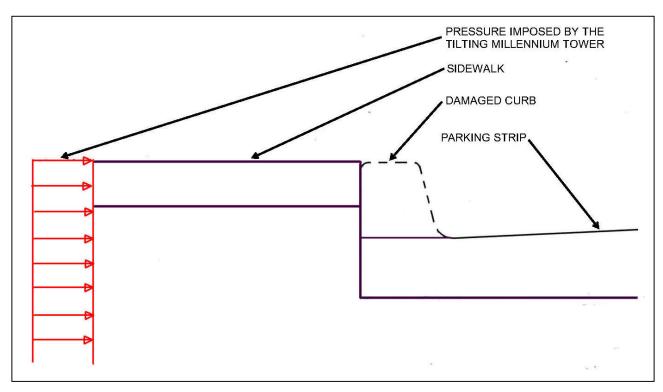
Annotated depiction of the concrete curb failure mode via pressure imposed from the tilting Millennium Tower.
